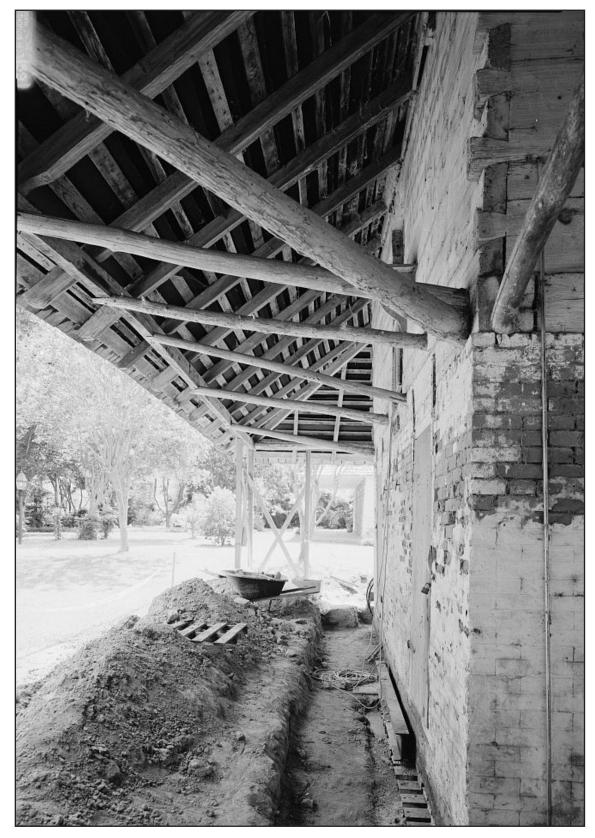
A 1980 Historic American Buildings Survey photograph showing details of the construction in front of African House during the Wilson and Koch restorations (Library of Congress, Historic American Buildings Survey, LA-2 -69-B-8).
